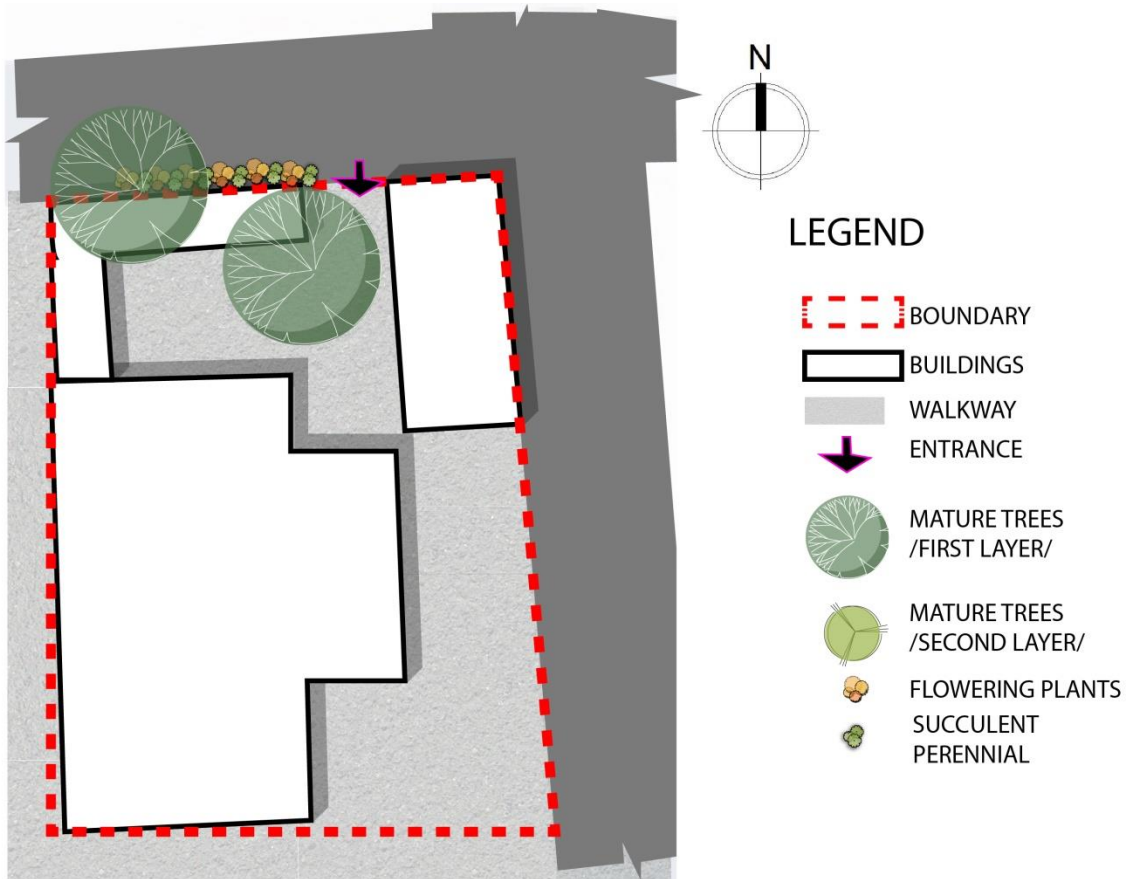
Plantation type and arrangement of Sessa Kebele Layout Plan of Home garden size less than 50m² (Source-Computed by the Author)
